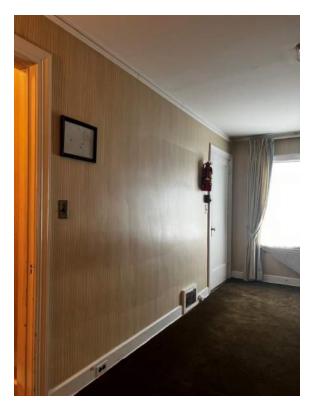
IMG_1507 – Second Floor Southwest Chapel – Wall finish exhibits bowing at interior walls. Fire extinguisher is not mounted in compliance with NFPA 10. Light switches and receptacles are not mounted in compliance with ADA.
